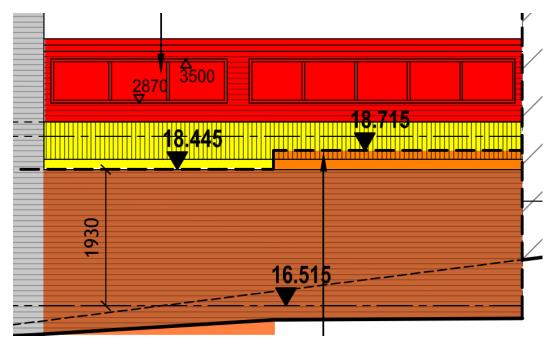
South elevation of ground floor living/dining extension. Red is the existing wall with no change to height or roof pitch. Yellow is the proposed extension. Orange is the existing dividing fence/wall.
